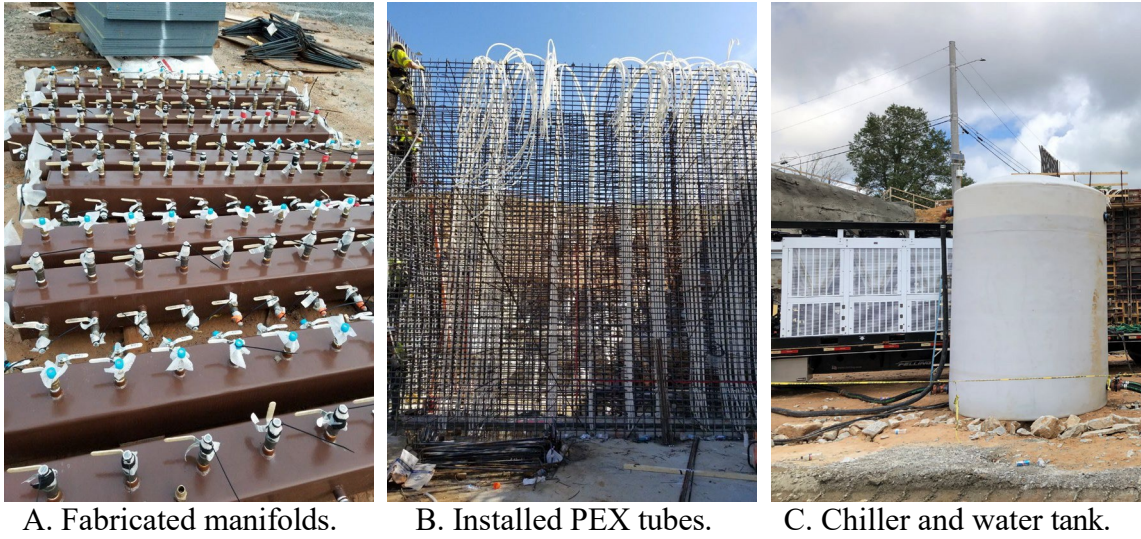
Photos. Post cooling system used in the SR-92 concrete abutment.
